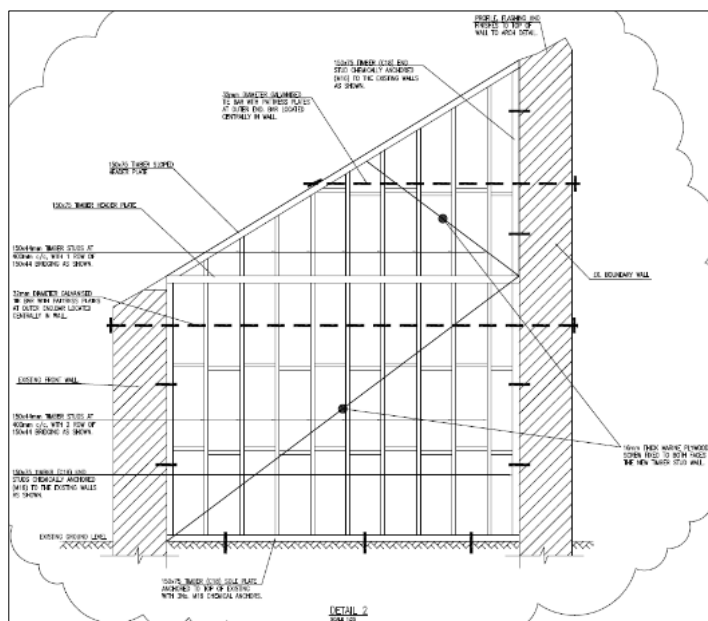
Timber stud and plywood structural cross wall braces long elevations. Extract LMC Consulting Engineers Drawing No. 5274-06-C2 May 2017
